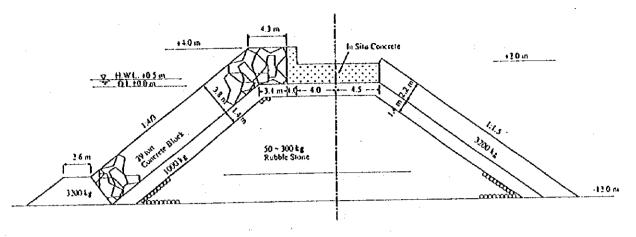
Standard Cross Section of Breakwater Rubble Mound Type (-12.0m)
